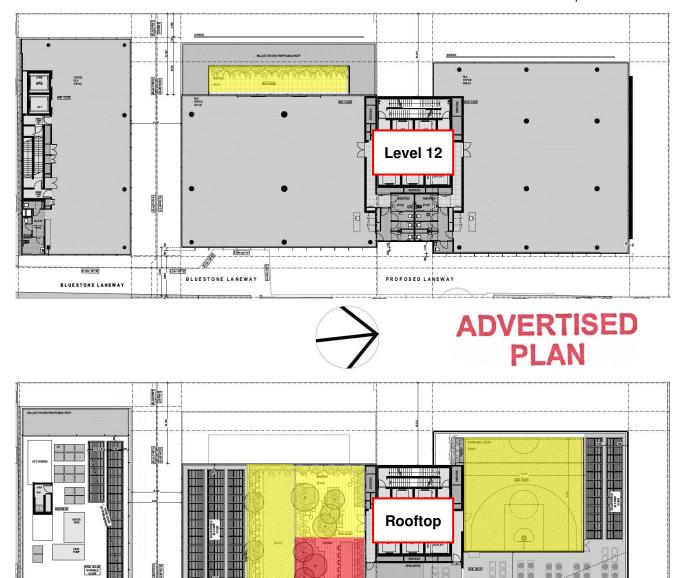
Level 12 (top) and rooftop (bottom) floor plans with the recommended wind criteria overlaid.
